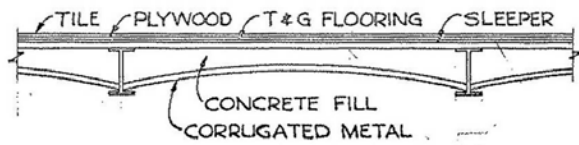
Sketch showing typical framing of the fifth and sixth floors.
